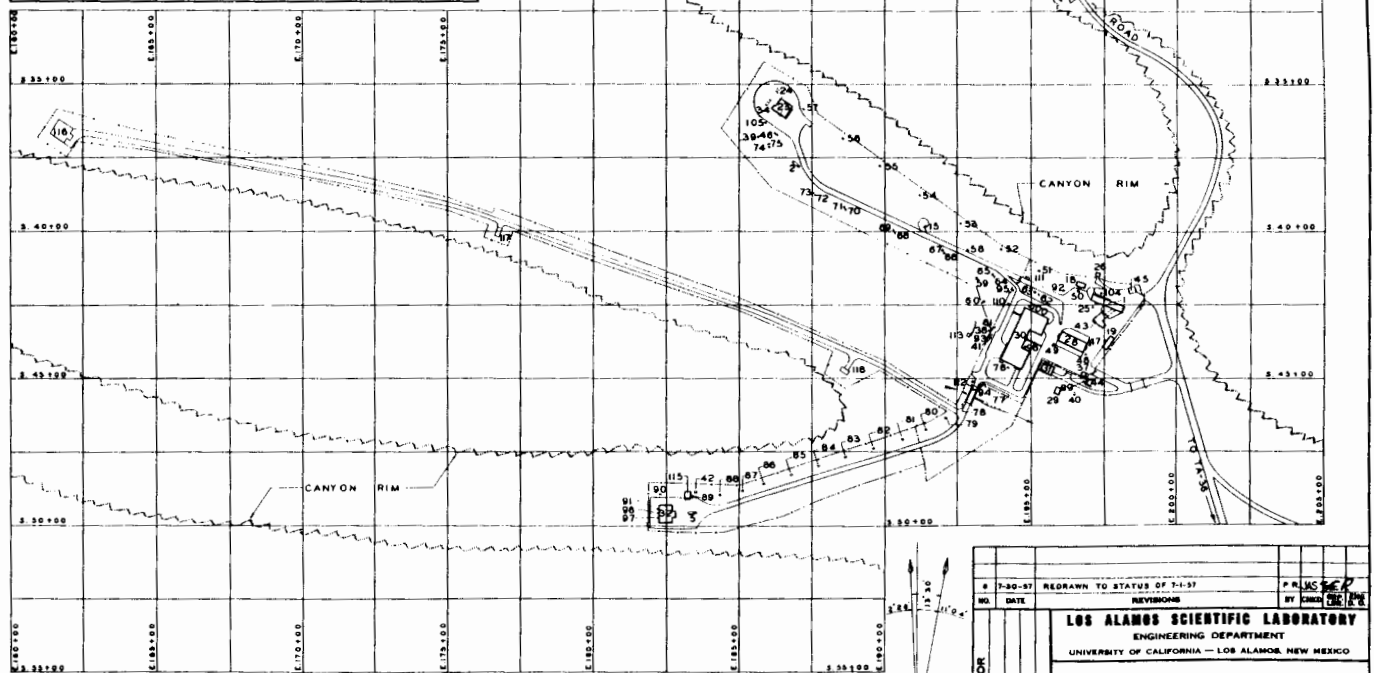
Structure Location Plan for TA-18 - Pajarito Site (1957 Drawing from the LANL Technical Area Structure Location Plans)
